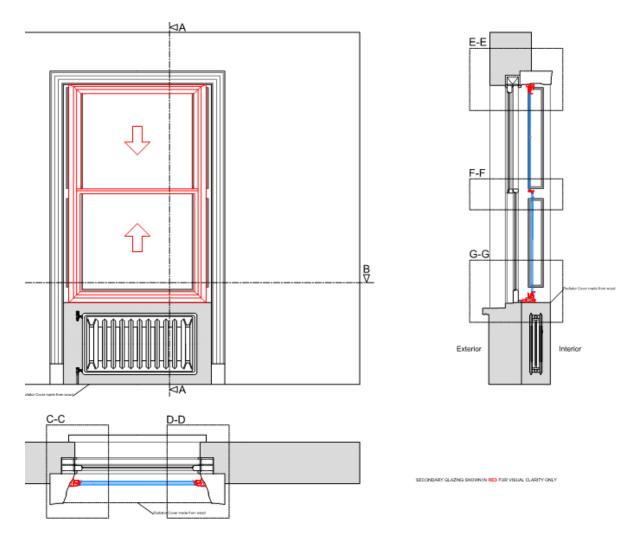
Proposed drawings showing secondary glazing fitted to reception room windows
